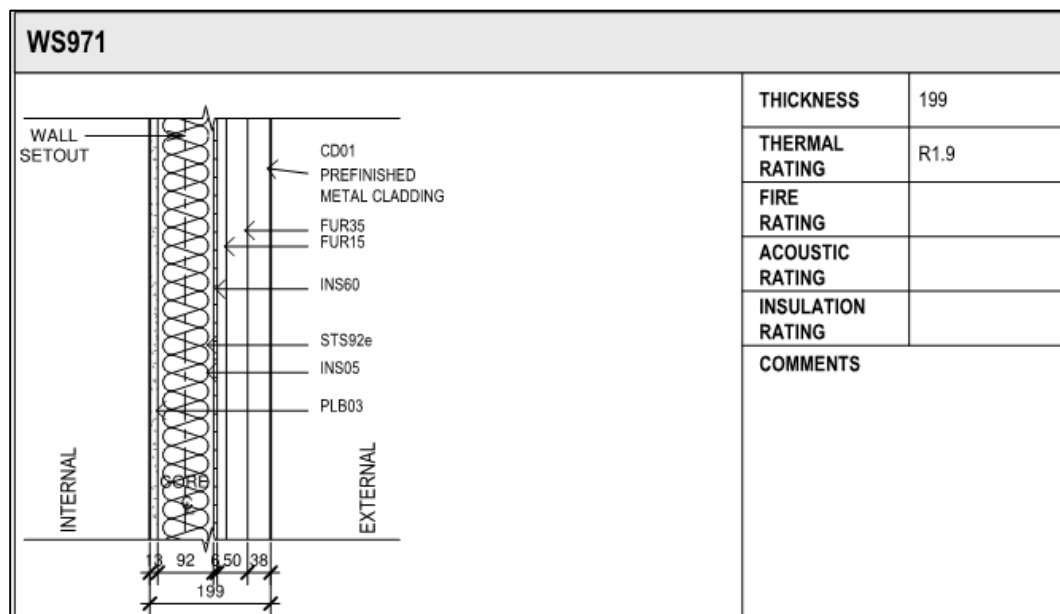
Stratco HiLand Tray CD01 : Source – Wall Type Plan M-AR-DW-8301 – Rev 6.
